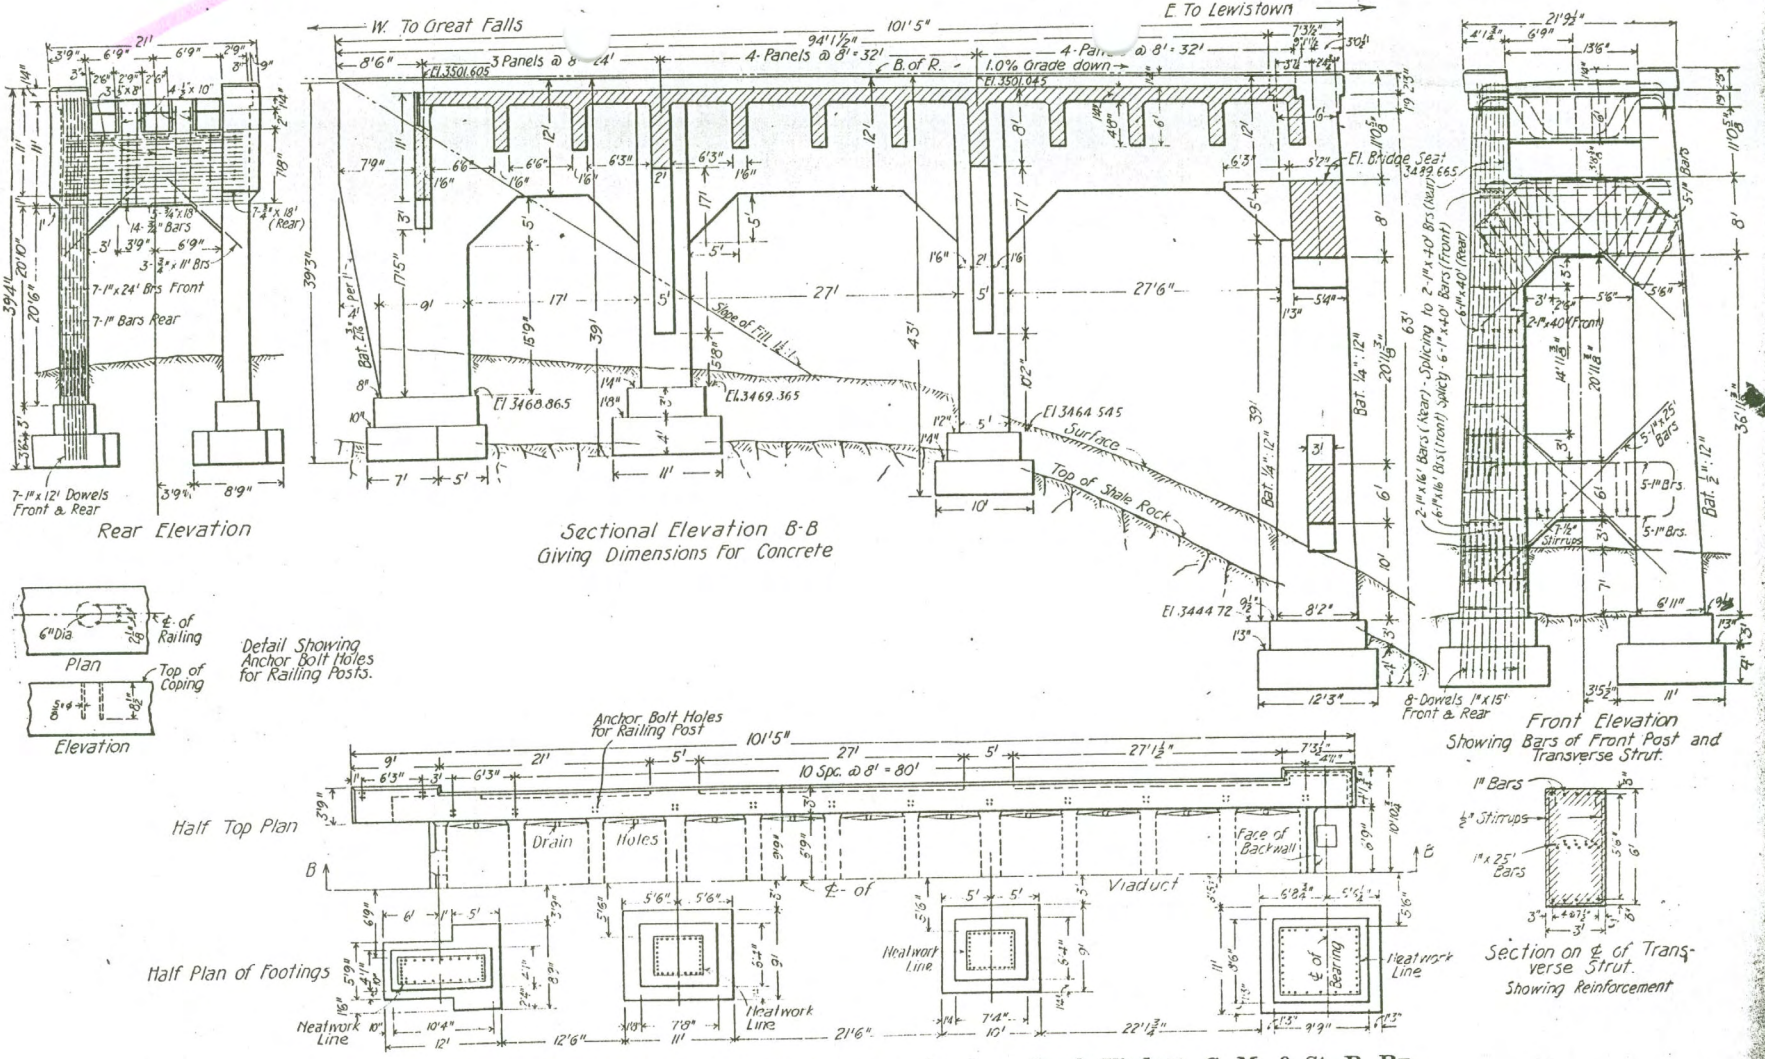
Plan and Elevations of West Abutment for Sage Creek Viaduct, C. M. & St. P. Ry.
